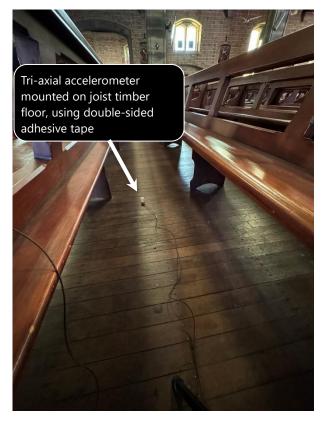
Equipment set-up at Hayberry Street, Crows Nest
